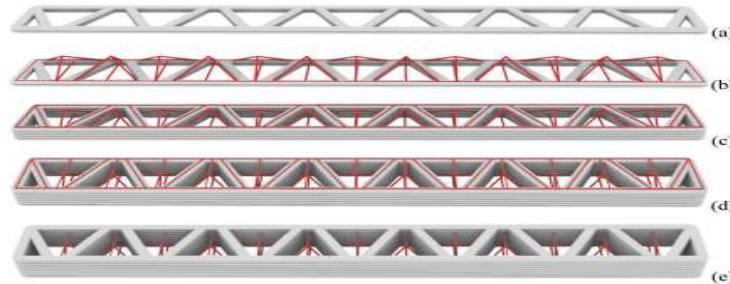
Key steps of 3D conical rebars reinforced 3DPC beam: (a) Print bottom concrete; (b) Lay 3D conical reinforcement; (c) Lay 2D truss reinforcement as needed; (d) Lay top 2D truss reinforcement and spot weld; (e) Print top concrete. [4]
